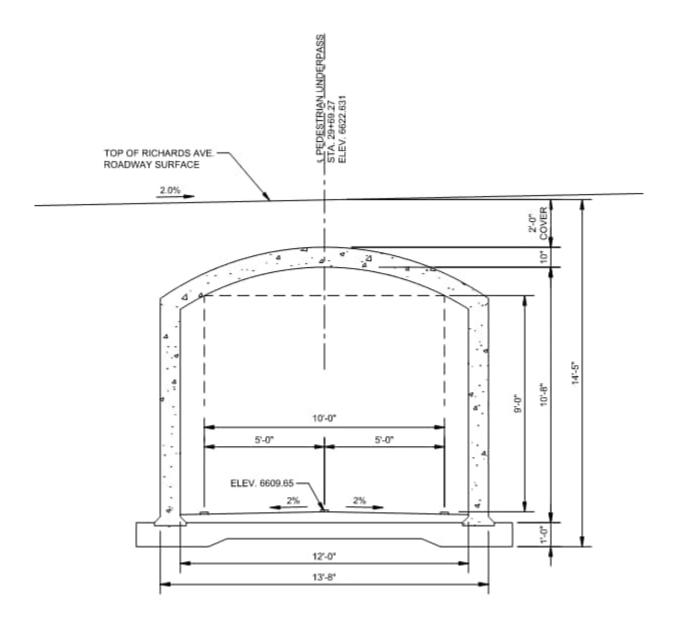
Alternative 3 - Precast Concrete Arch Typical Section
